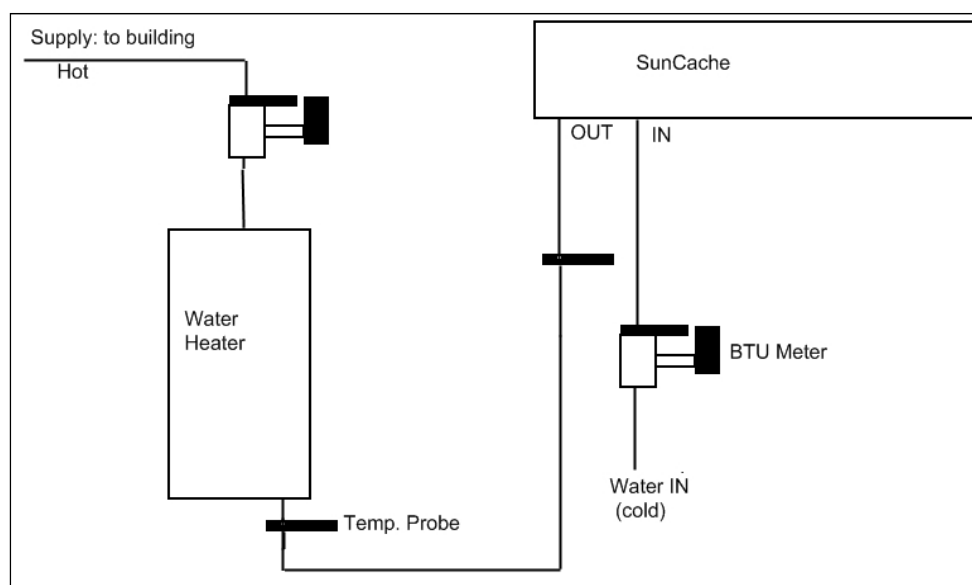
Claremont Brooks St – Plumbing Diagram
